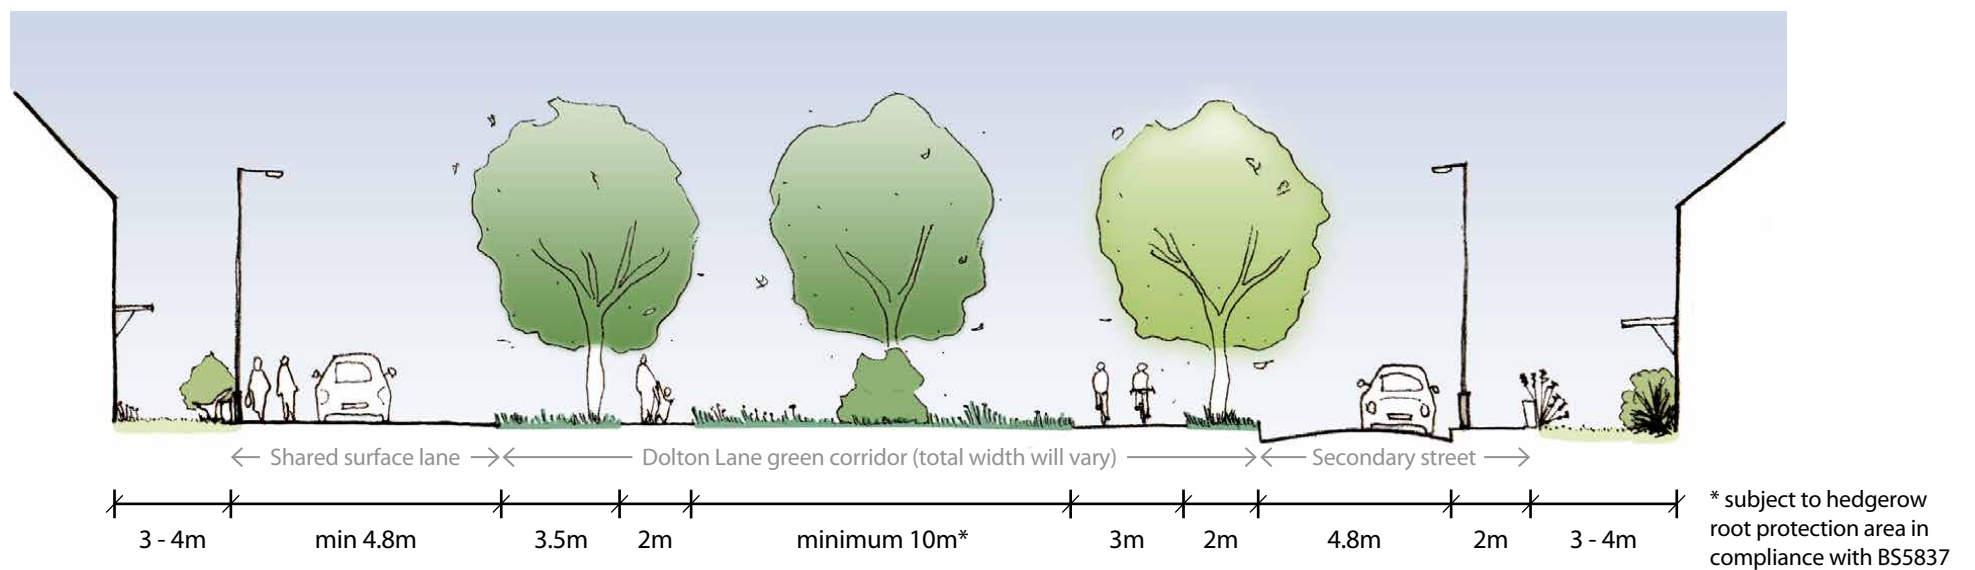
B-B – typical secondary street cross section showing relationship to Dolton Lane green corridor (refer to Fig. 15 for section location)
